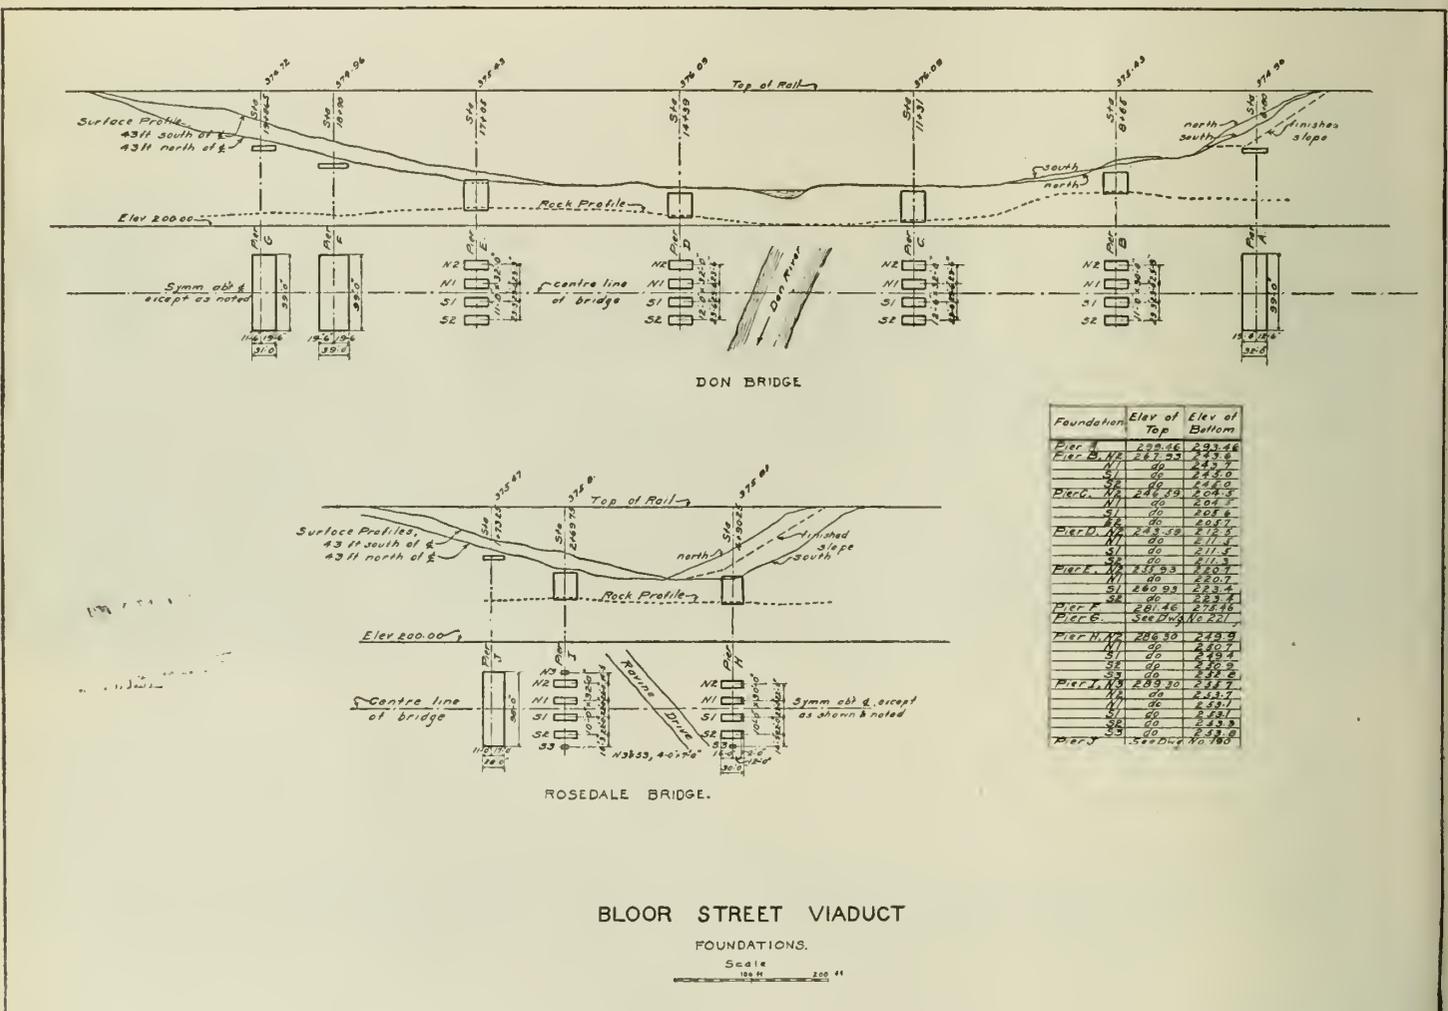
Foundation Plan, Don and Rosedale Bridges.
